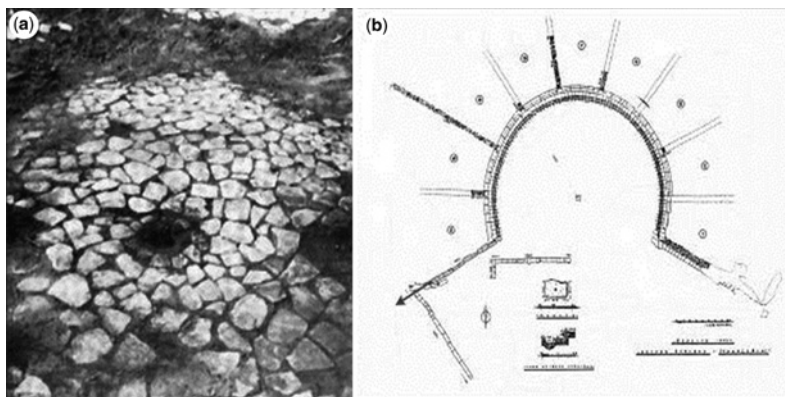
Aigai: (a) Palace, drainage holes on the floor and (b) Theatre, drainage canal (Kaiafa, 2008).
